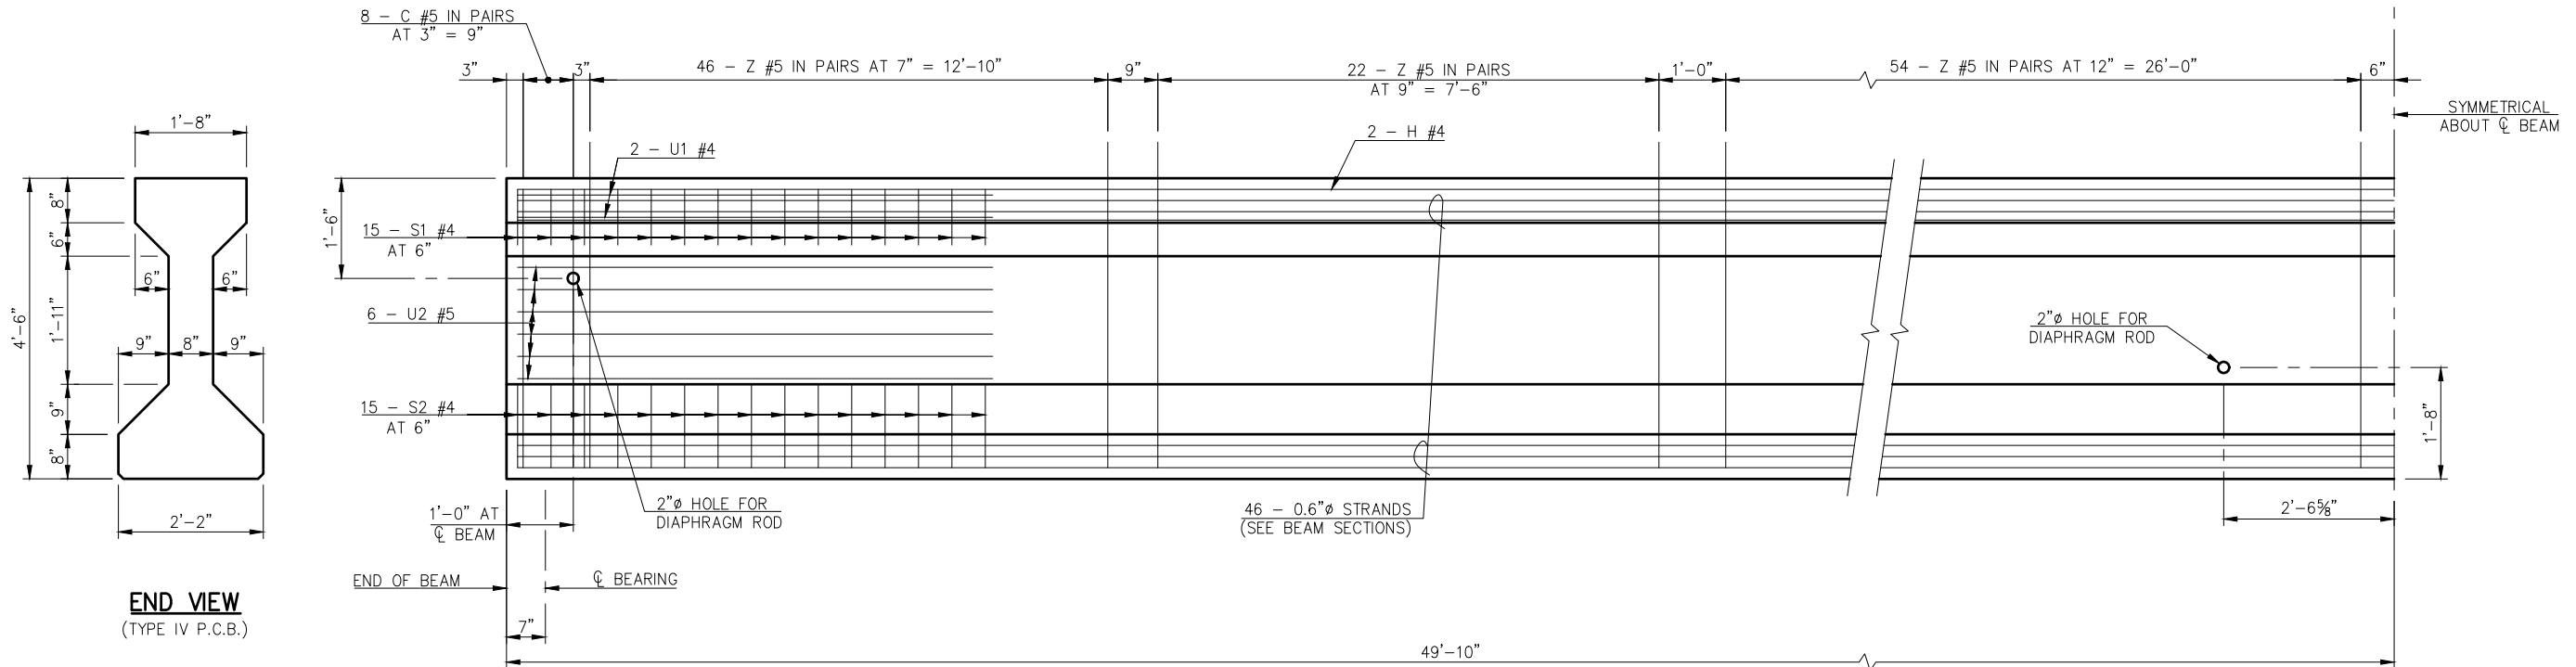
DETAILS OF TYPE IV P.C. BEAMS (85' SPAN)
